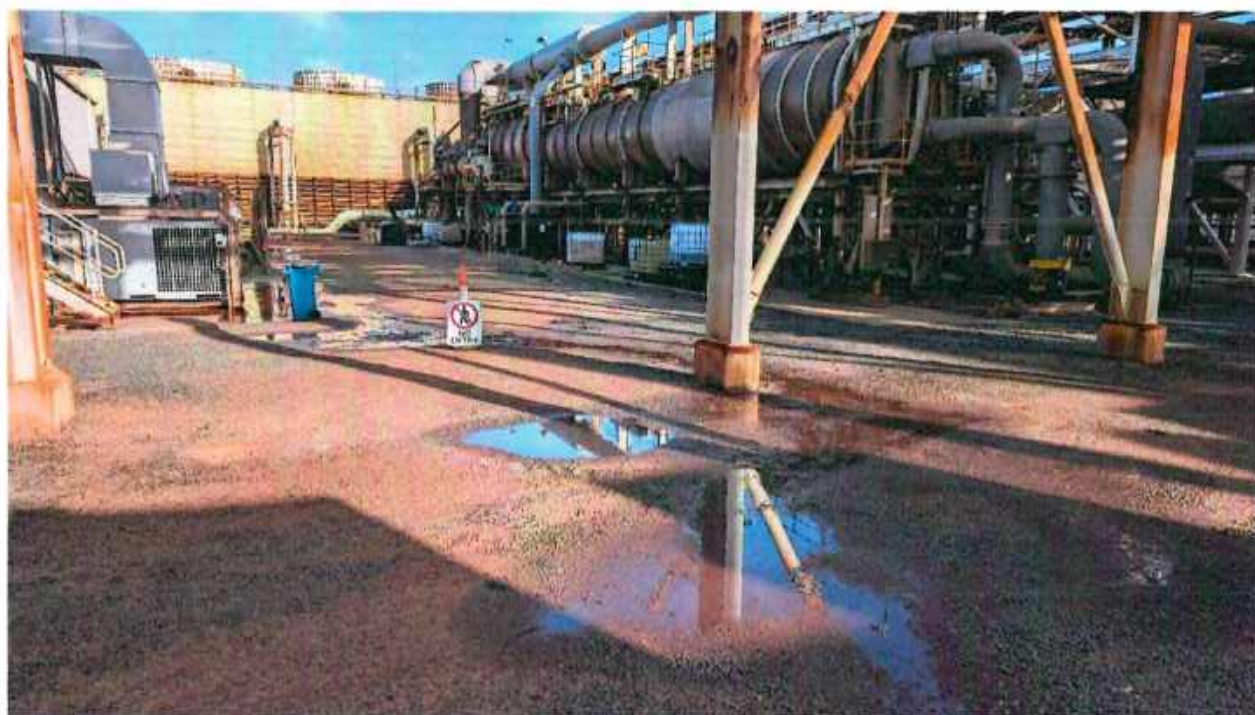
General view of fuel spillage path through water treatment area of the RNO plant toward drainage infrastructure
